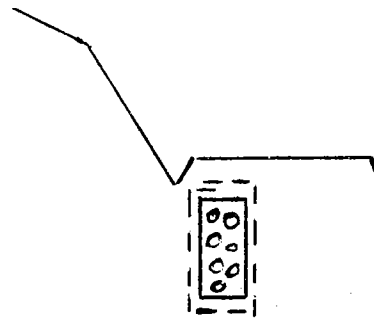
shows some typical details for installation of plastic filter cloths. Vertical rock drains with horizontal drain outlets have been used successfully to remove groundwater in the layered glacial sands and silts in Seattle, Washington. Vertical rock drains protected by plastic filter cloth (Figure 2f) can be installed placing gravel in cloth tubes inserted in hollow stem augers or cased drill holes. Photographs of actual installations are shown in Figures 3, 4, and 5.
